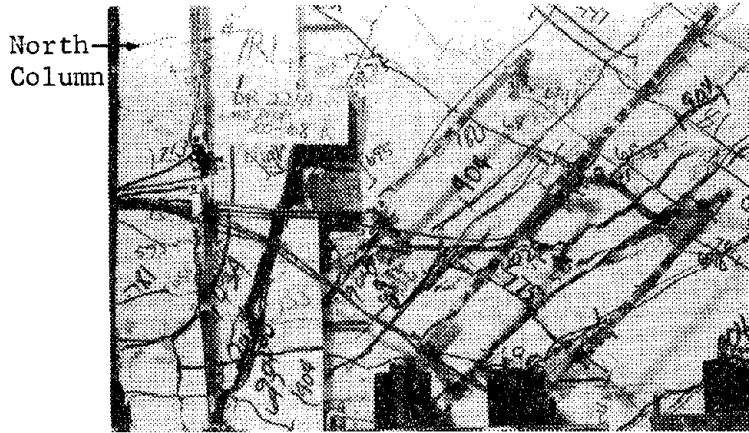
CRUSHING OF CONCRETE IN THE NORTH CORNER OF FIRST-STORY WALL PANEL OF SPECIMEN SW7 EPOXY-REPAIRED. LP 1145,  $\mu_{\delta} = 6.4$
